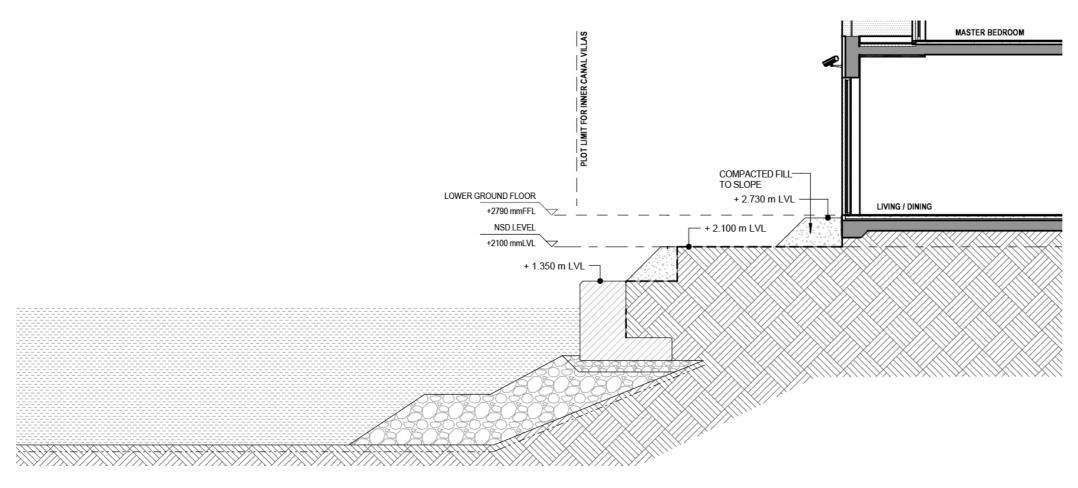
Typical Rear-side section of Inner Canal Villas without Landscape
